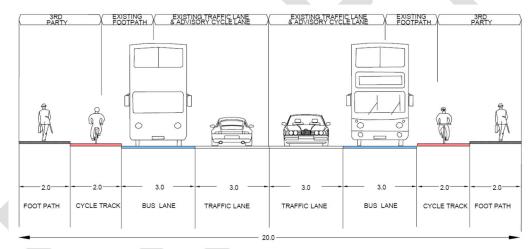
Proposed EPR Subsection 3.2B Indicative Cross Section
